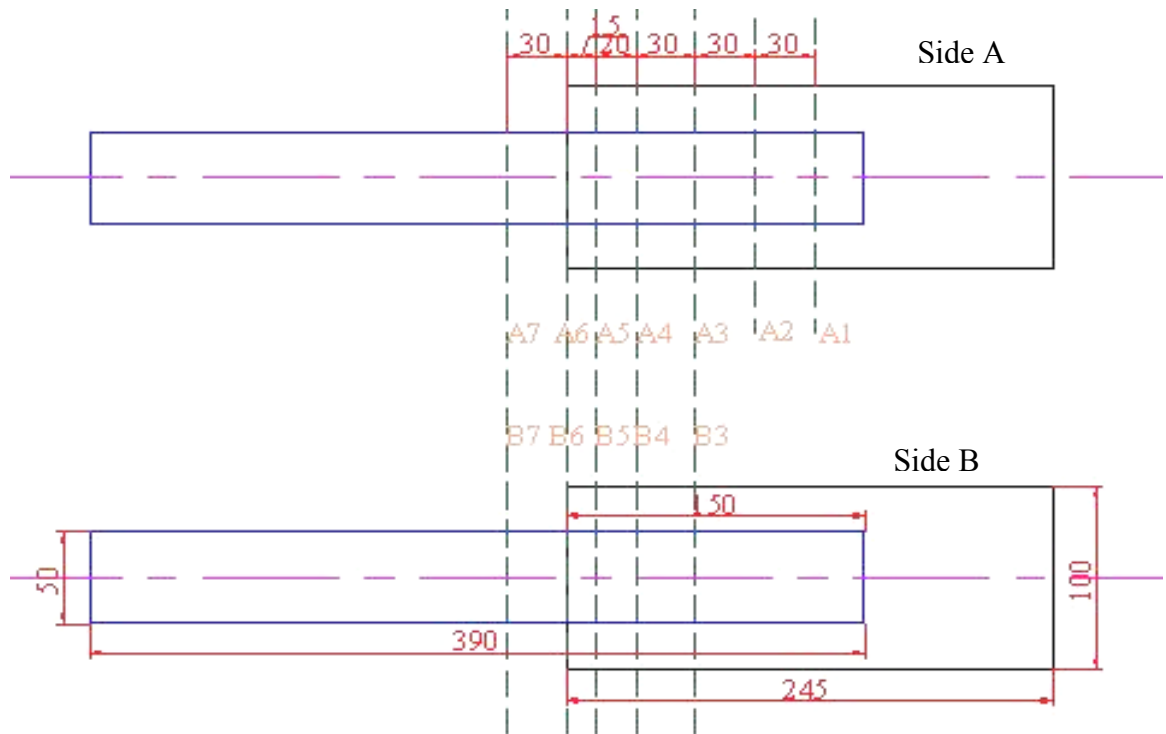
(b): CFRP plates bonded concrete prism specimen details (Control II and Hot/Dry/Wet samples)
